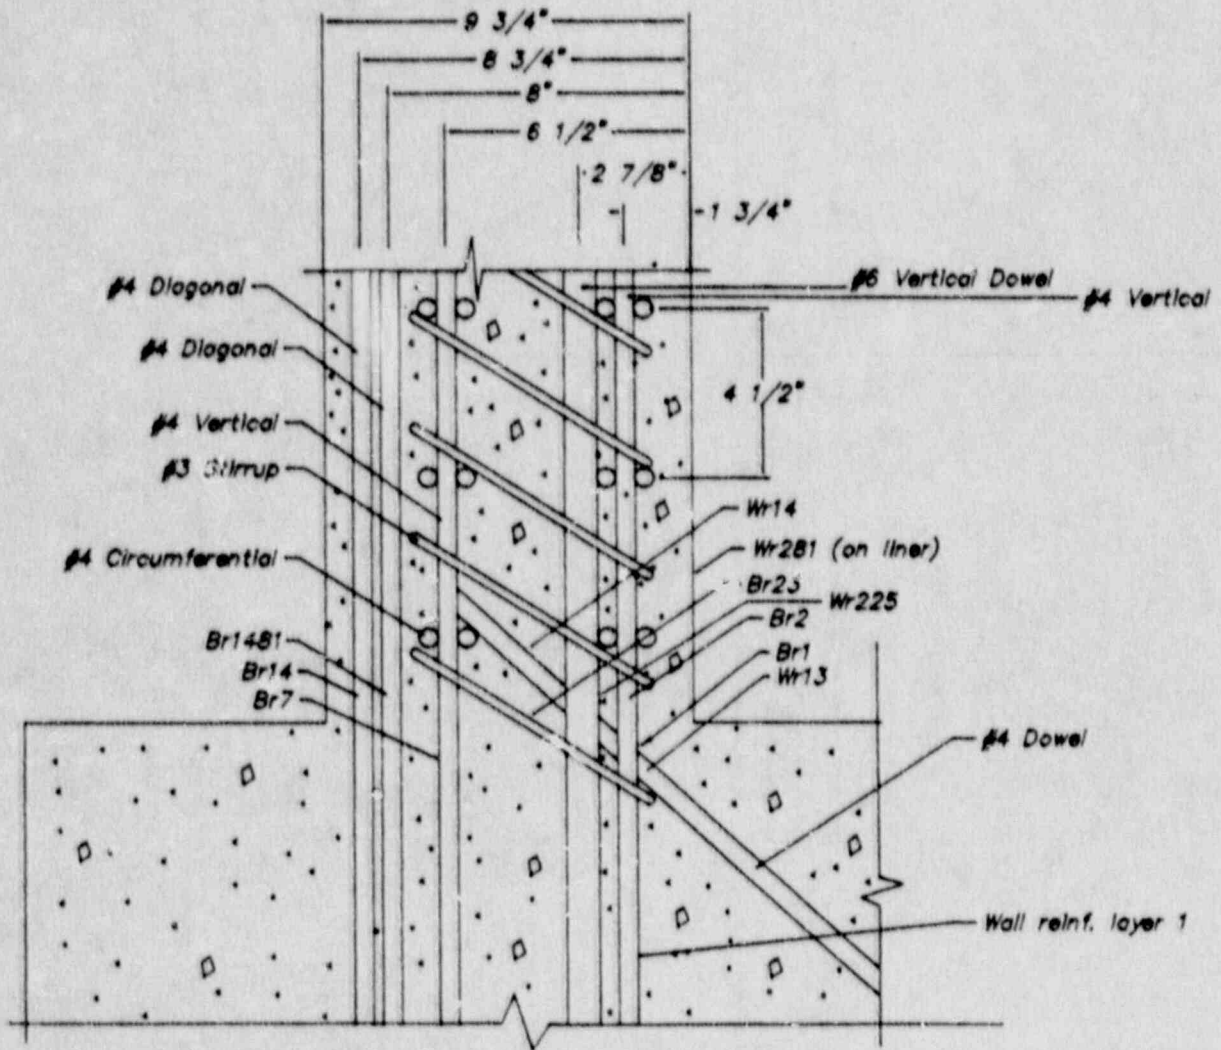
Wall Reinforcement at Wall-Slab Connection
